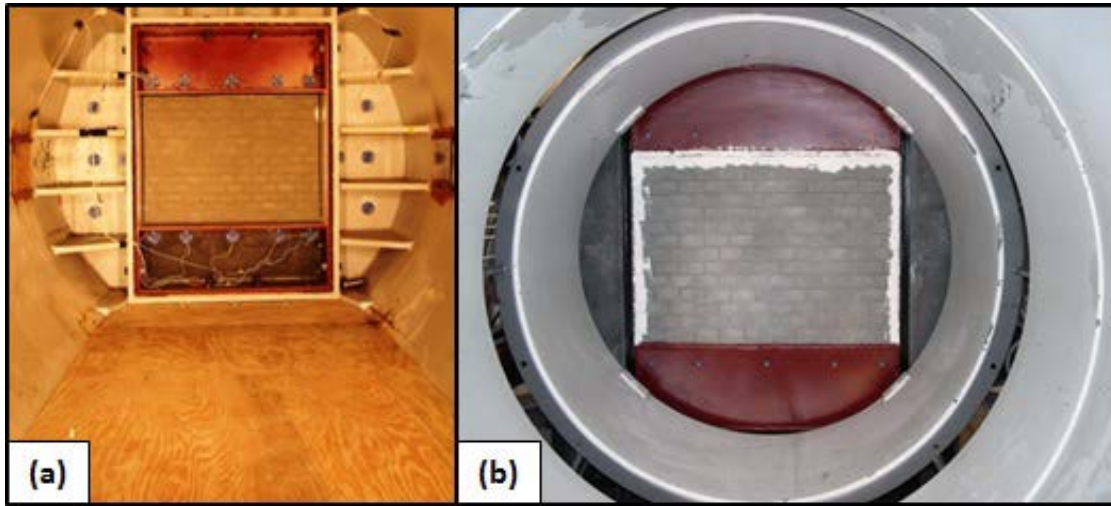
BLS1. (a) Pretest interior view of target vessel. (b) Gaps between the CMU wall and steel frame filled with drywall joint compound.
